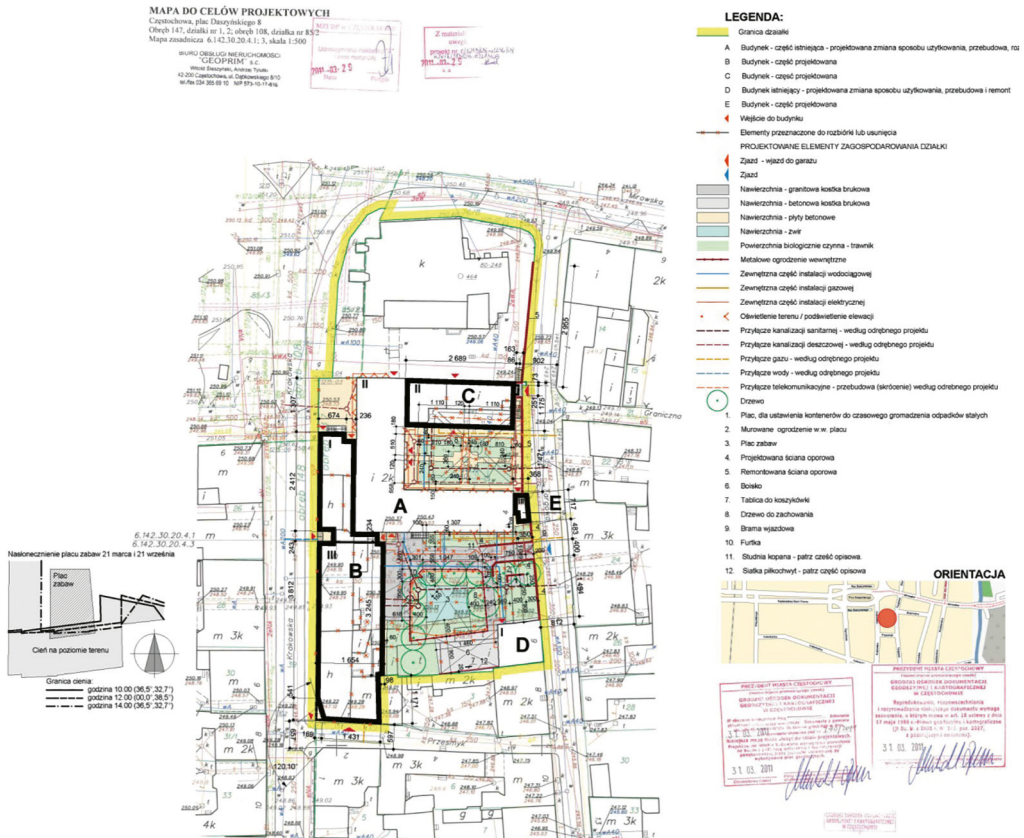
Revalorisation project — urban layout. A — existing monastery building, B, C, E — planned buildings, D — existing adapted building. Project authors: arch. M. Błażewicz, arch. S. Oset [VI]
